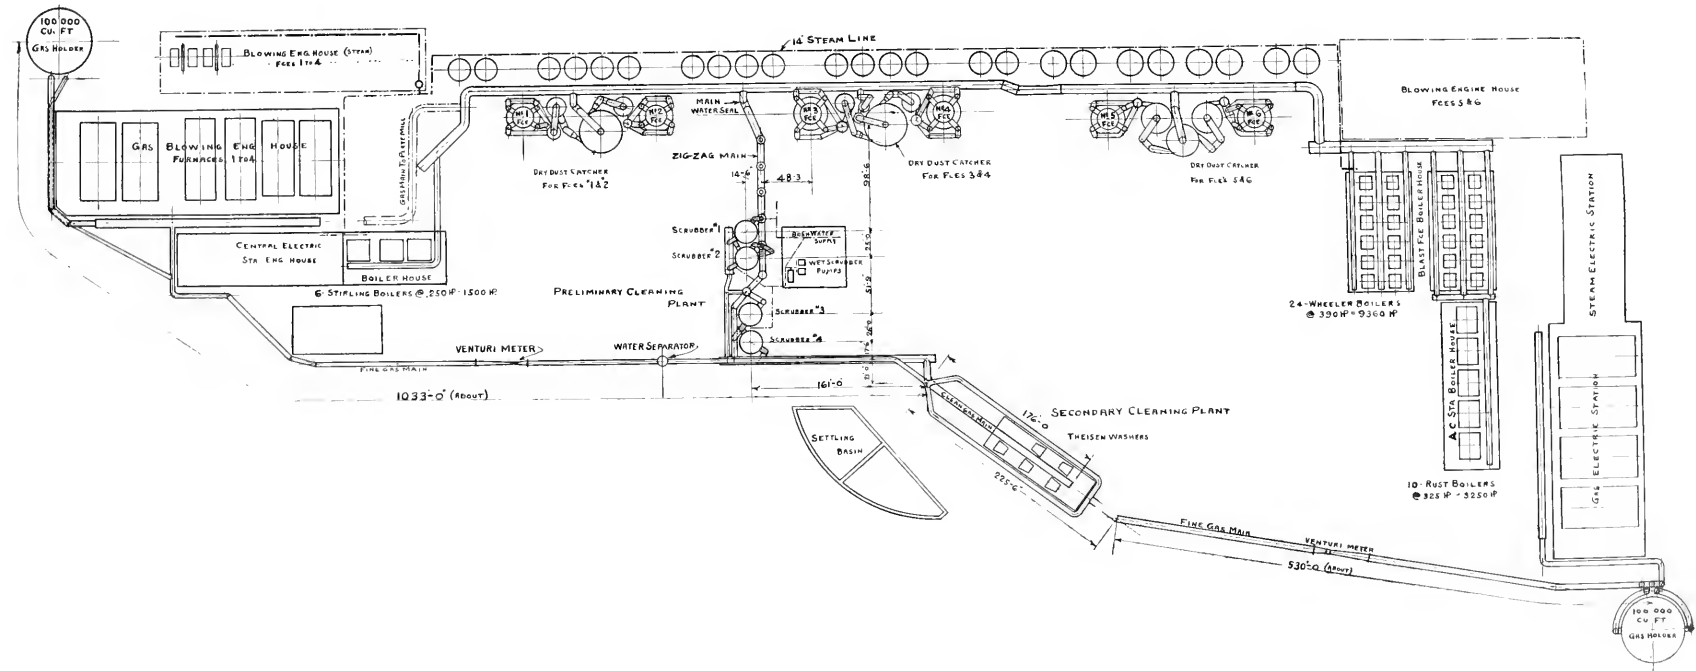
ARRANGEMENT OF GAS POWER PLANT P10
